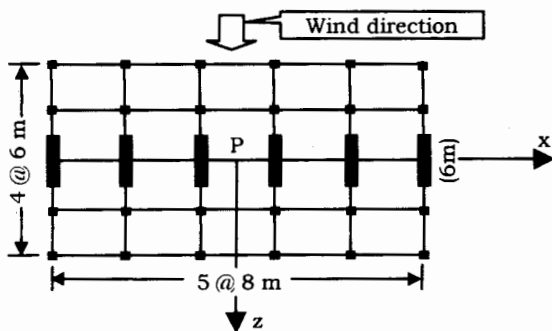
Plan of Bisymmetric Frame-Shear Wall Structural Model
